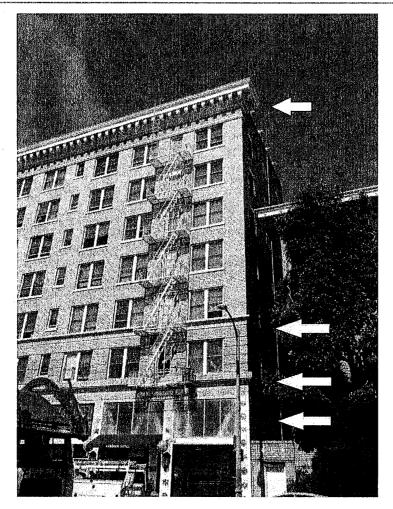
Photo showing decorative terracotta details and detailed cornice.
